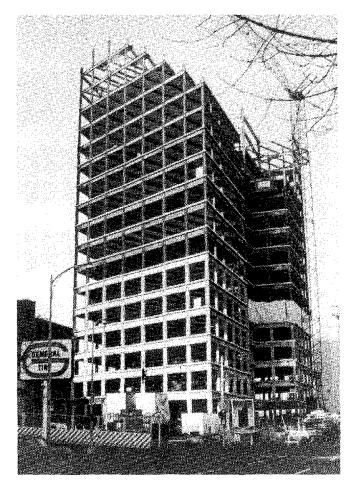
Moment-Resisting Frame, Fourth and Blanchard Building, Seattle, Washington. (Photo courtesy United States Steel.)
